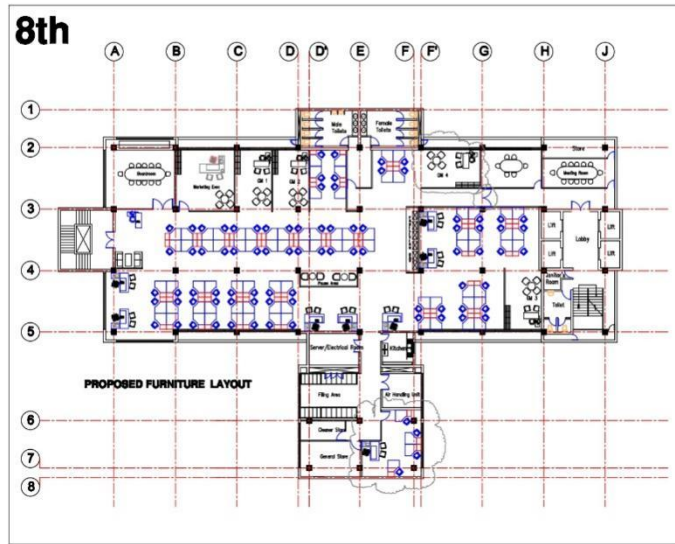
MTN PLAZA Office 8th Floor Plan
